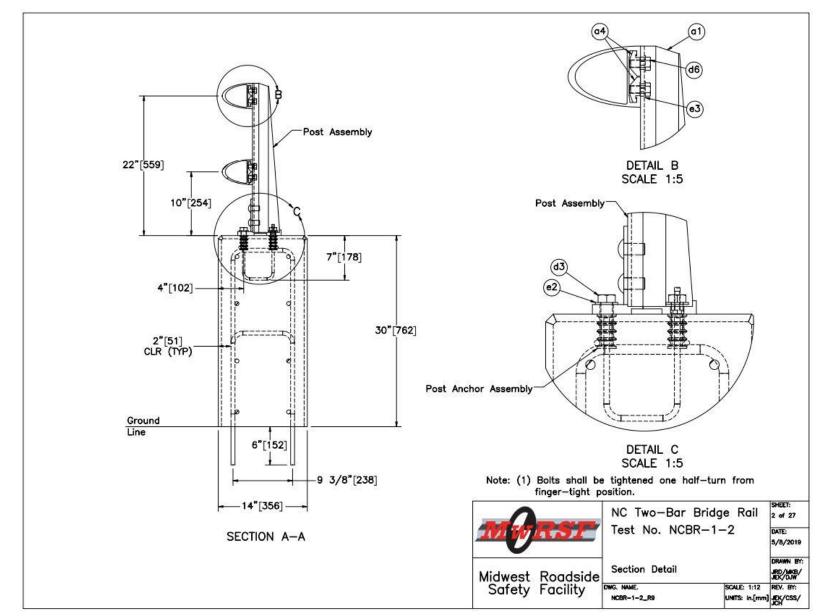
Section Detail, Test Nos. NCBR-1 and NCBR-2
